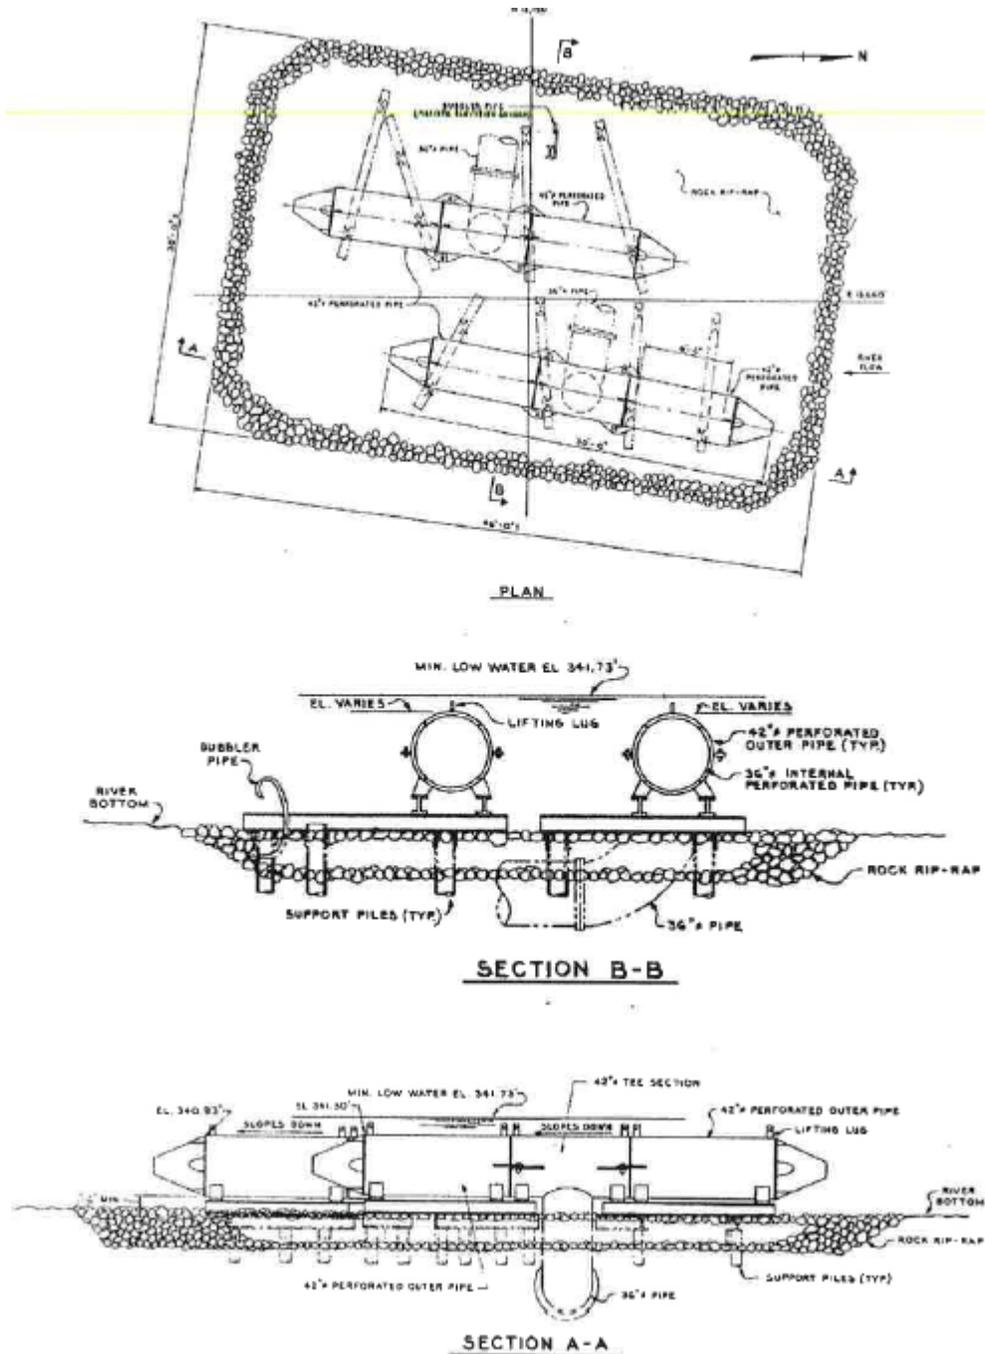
Perforated intake plan and section (Coutant 2014)
